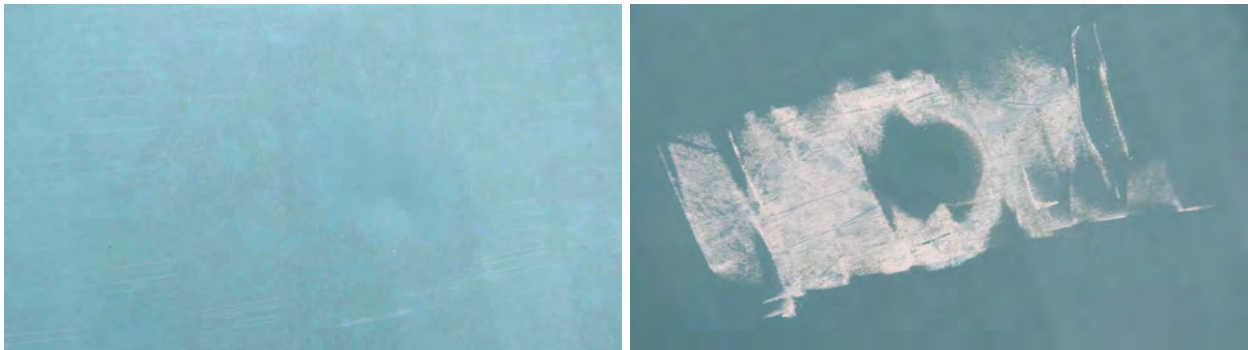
Roofing on the maintenance building (7) with no hail damage.
